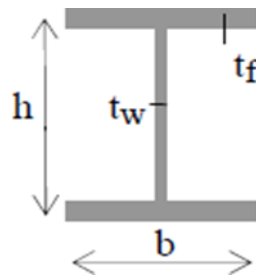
bi-symmetric cross-section of the beam (elastic)
